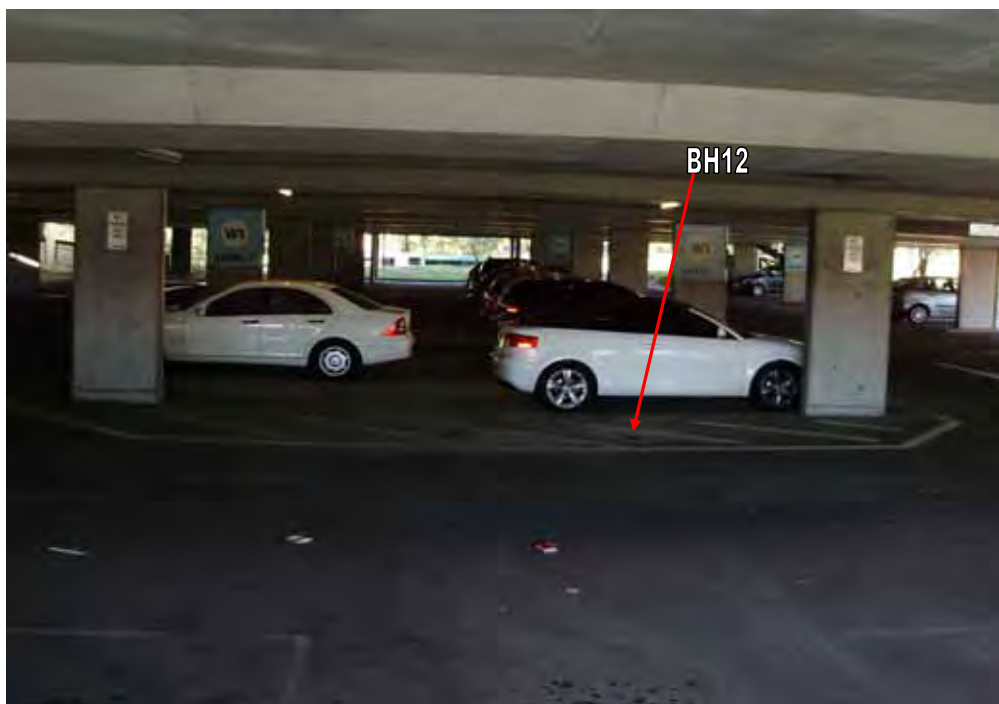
Location of BH12 within W1 car park facing south towards University Avenue
